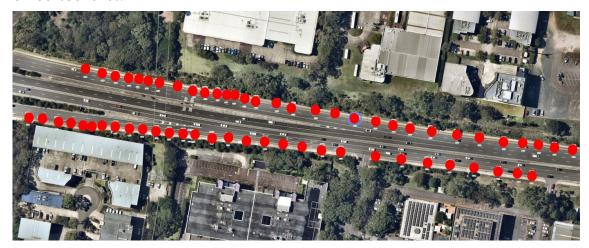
Location of the pits at Warringah Road (Source: Nearmaps Jan/25)
